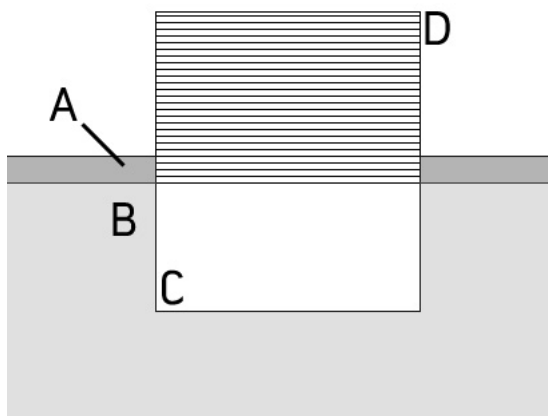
Open-bottom Raised Bed Garden Cross Section. A: Grass, B: Native Soil, C: Excavated Soil Region, D: Raised Bed Frame
